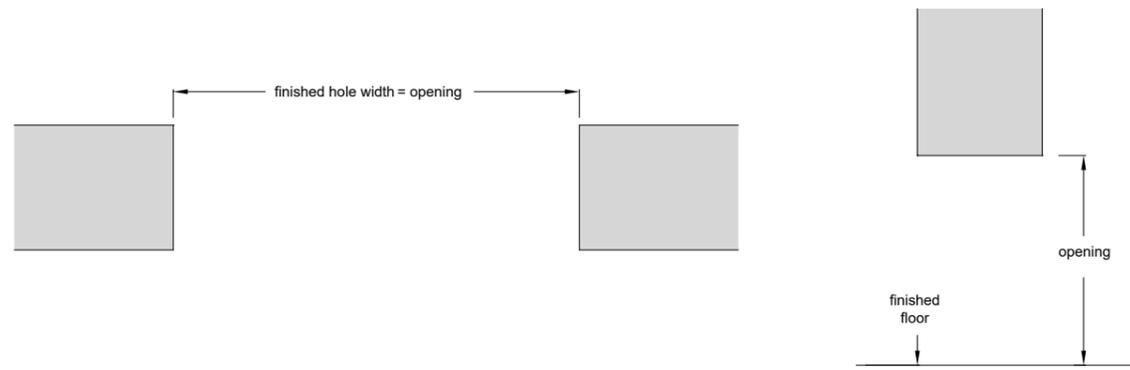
Measurements useful for calculating the doors to be installed inside holes without jamb
